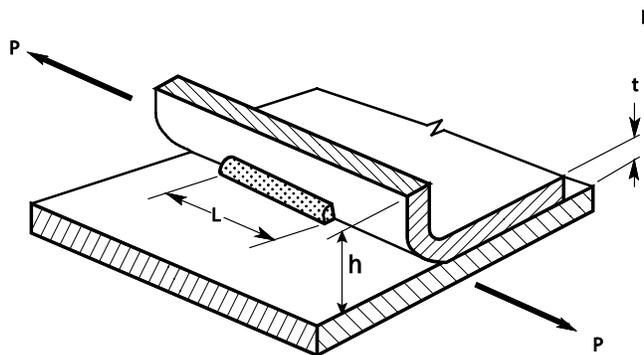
Shear in Flare Bevel Groove Weld
